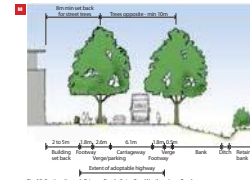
Section through Primary Road - Spine Road Northern Living Road
